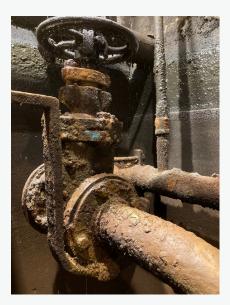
inch water pipe joining 3 inch water pipe and condenser cooling water valve to B&W
